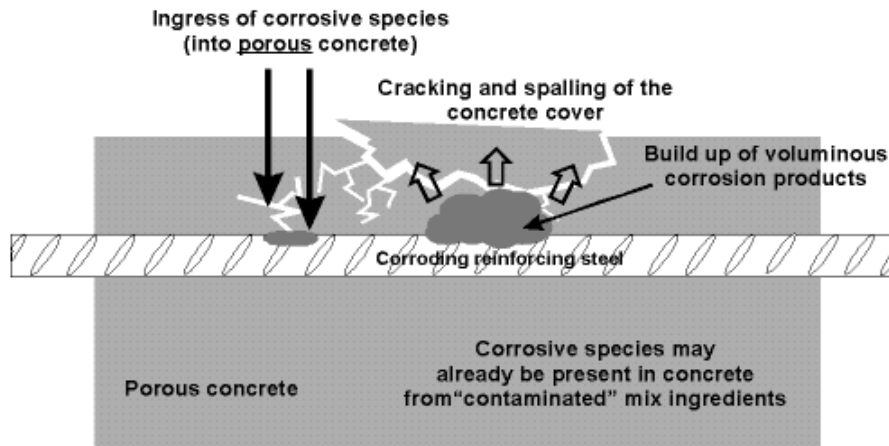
5. Schematic diagram showing spalling of concrete due to corrosion damage [50].
